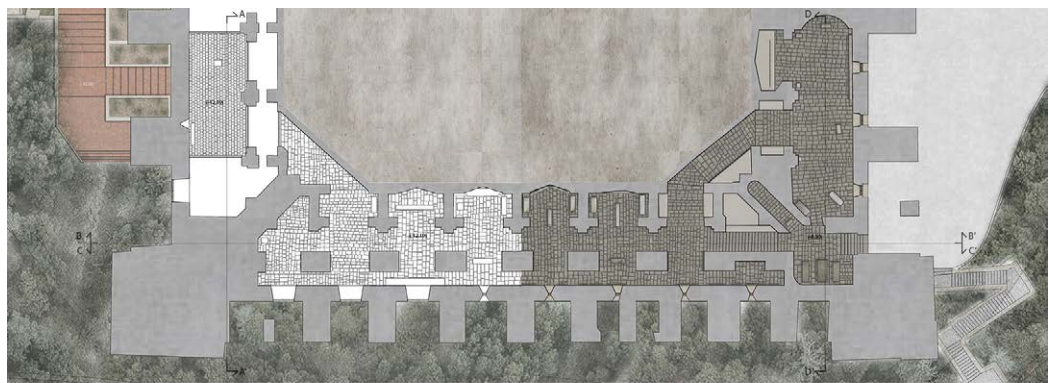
Plan and sections of the "Chapel". Elaboration by the authors.
